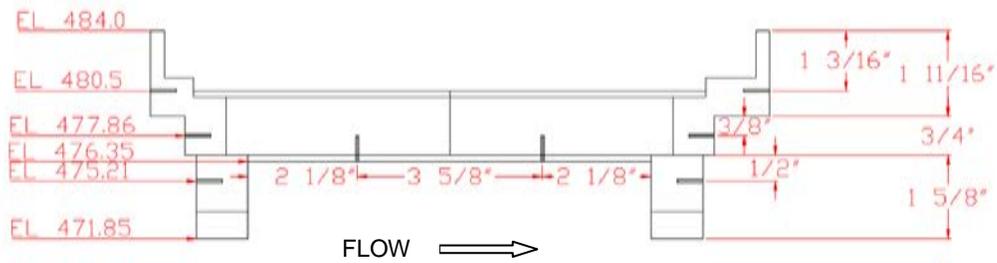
Locations and elevations of pressures taps on bridge. Dimensions are in model scale.
